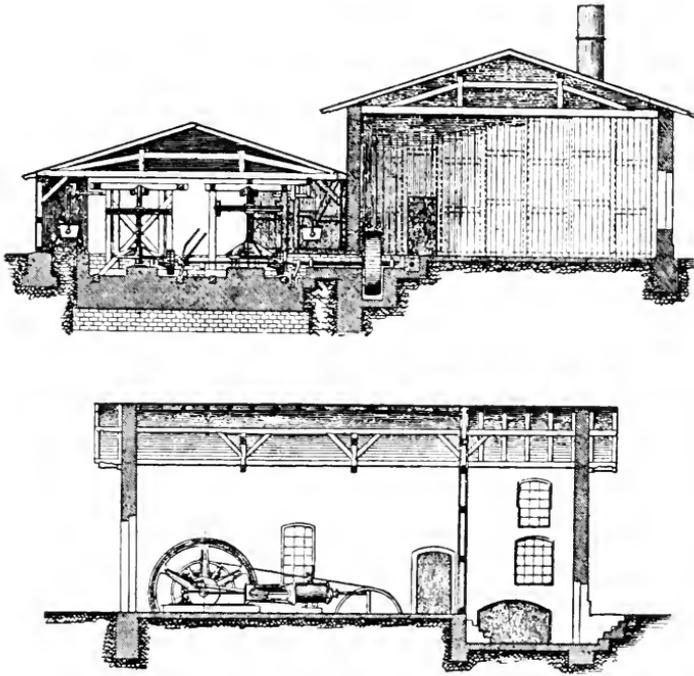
, 357.—OTTO AERIAL ROPEWAY. PLAN AND SECTION OF ANGLE AND POWER STATION.
